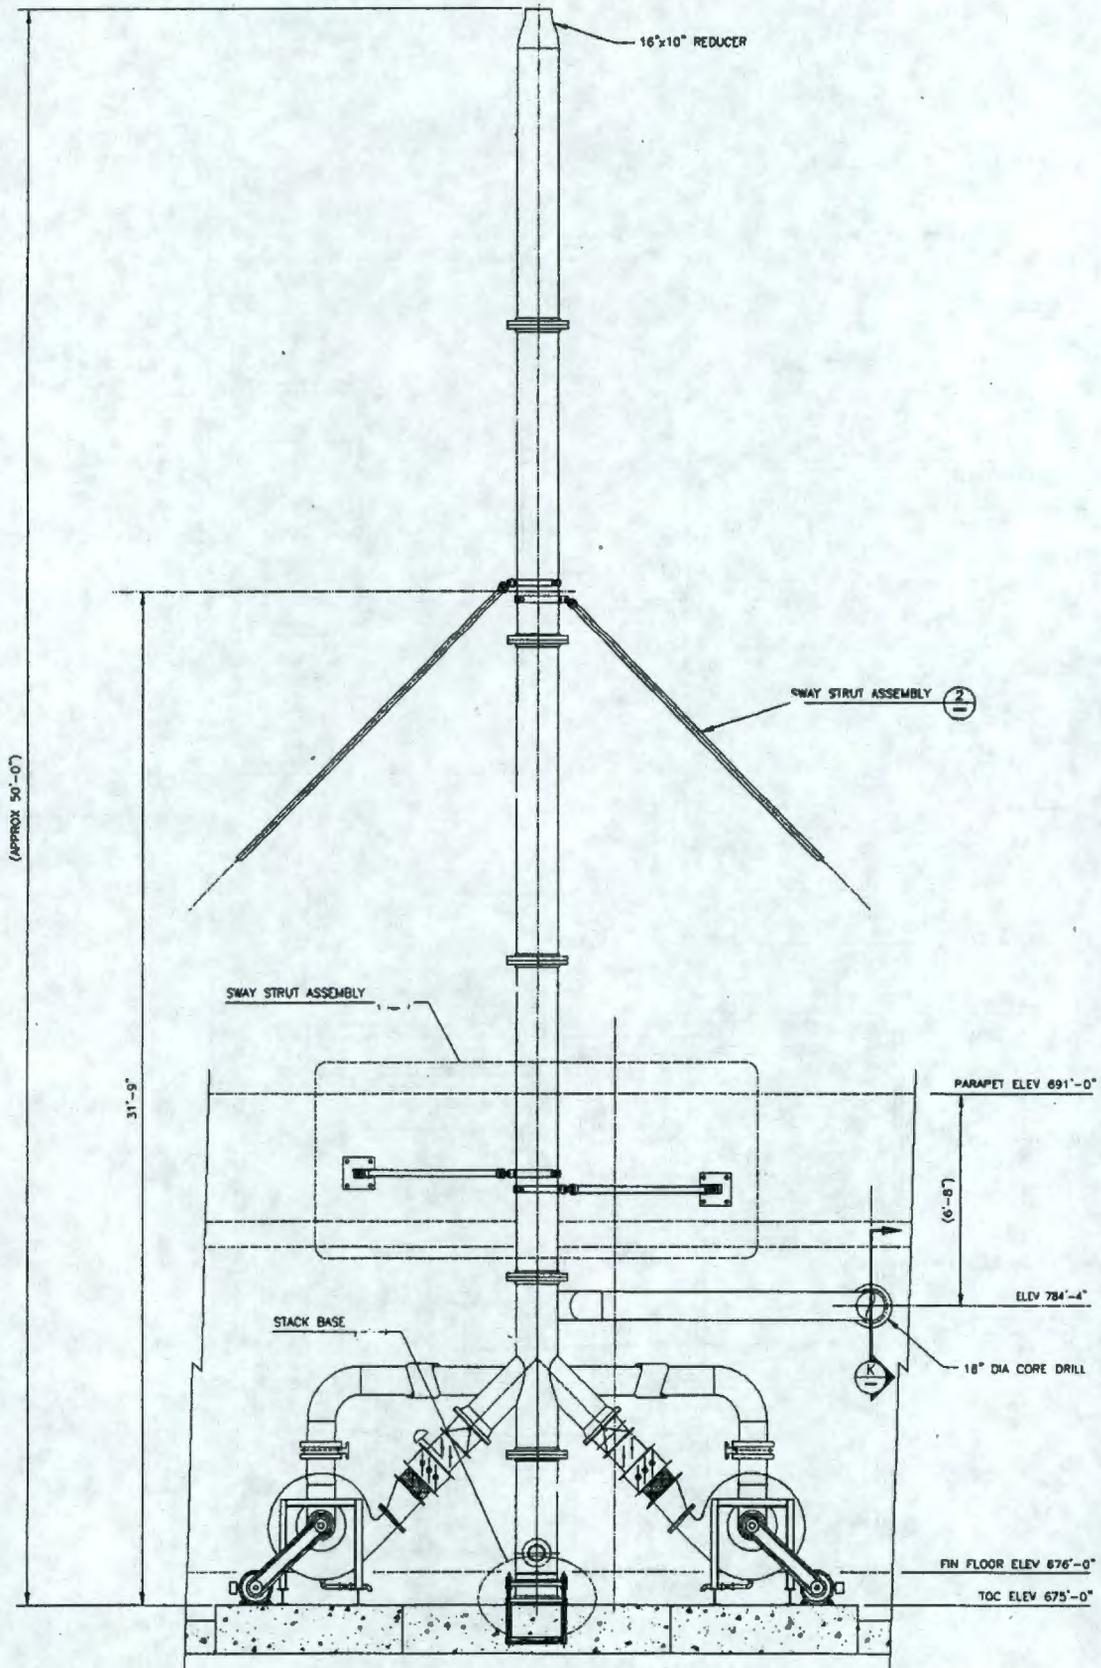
2736-ZB Building New Process Exhaust System Stack.
